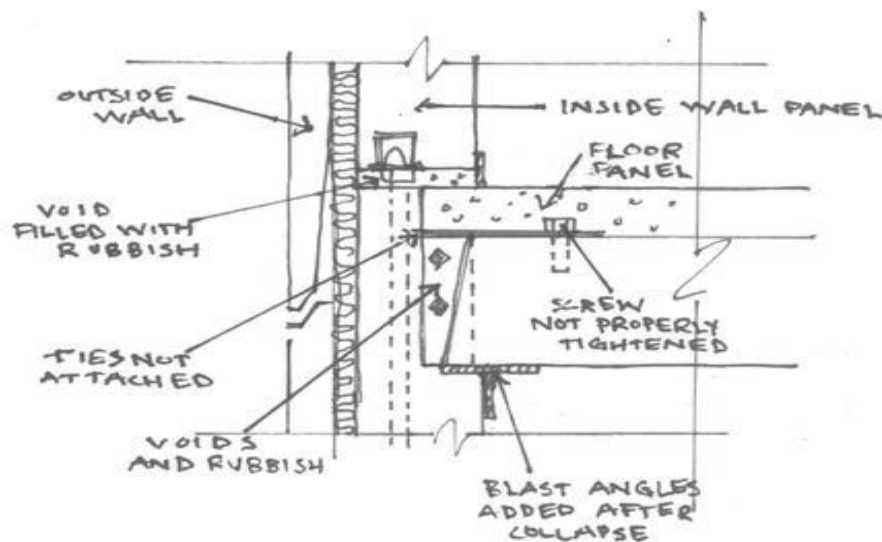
Exterior horizontal joint between floor slab and flank wall as built (failures.wikispaces.com)
